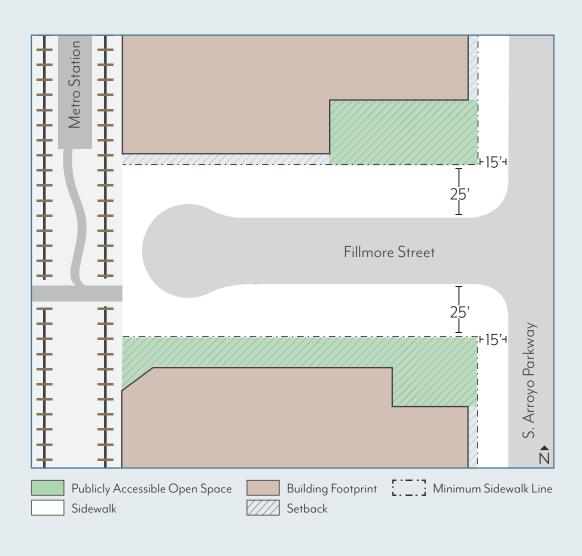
Possible Configurations for Publicly Accessible Open Space Plaza Requirement at Fillmore Street and Arroyo Parkway
